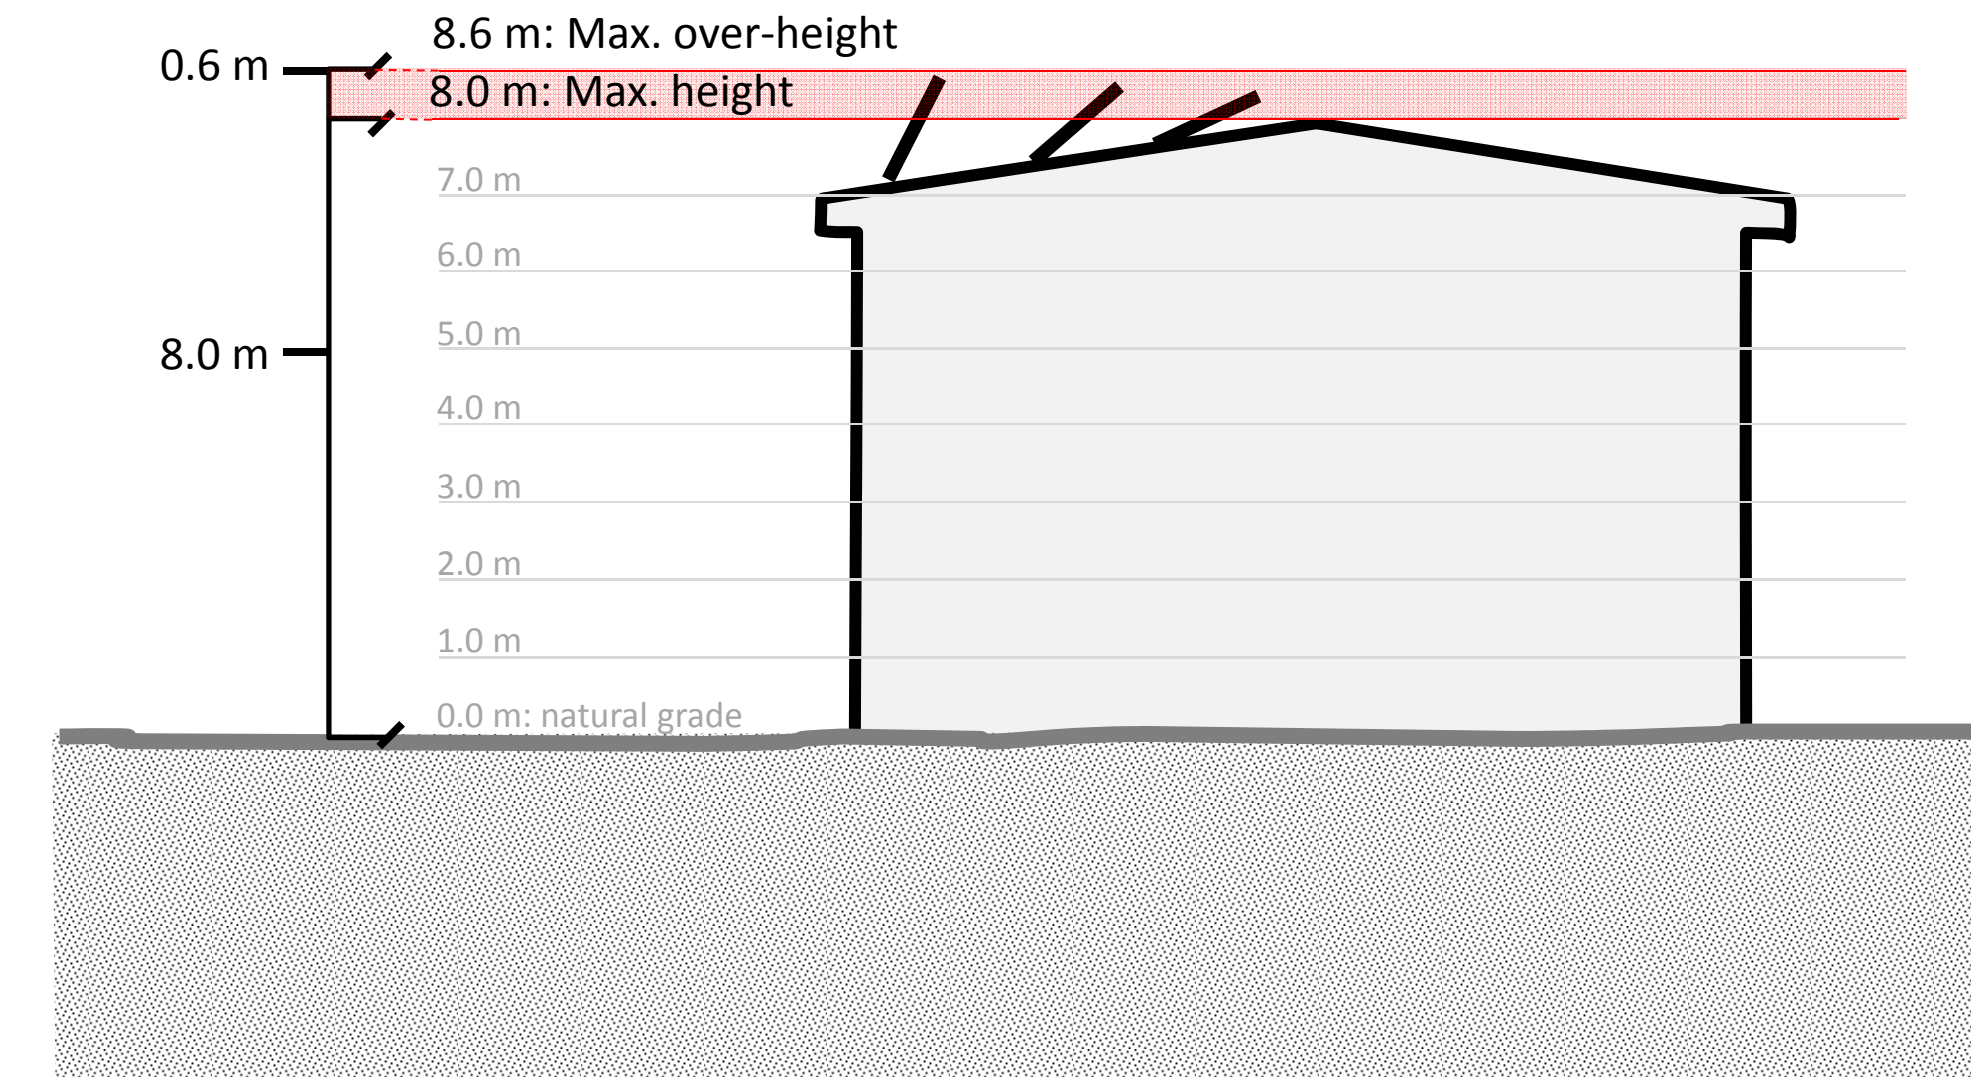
Gently Sloped Roof Built to Maximum Permitted Height (Bylaw 500)
